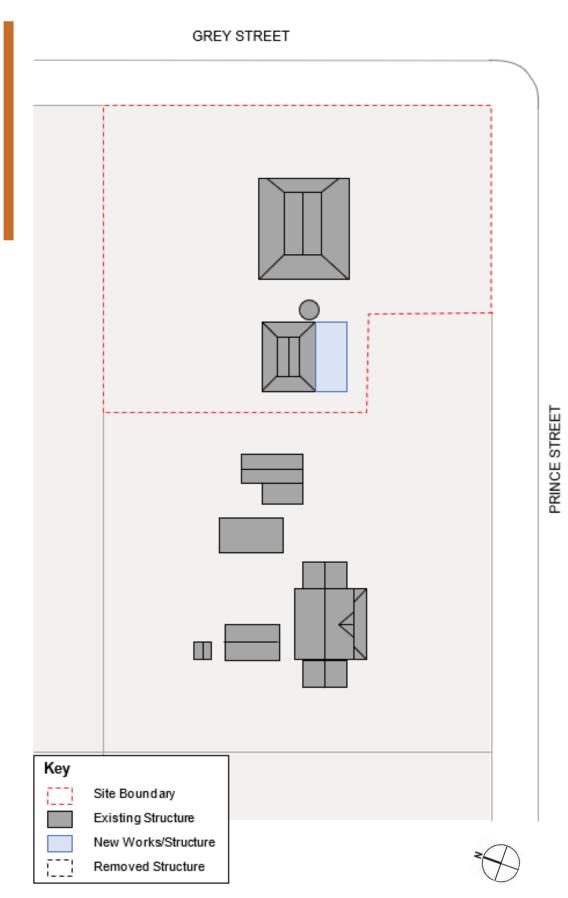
Clarence Town Courthouse and site period of construction - 2007
